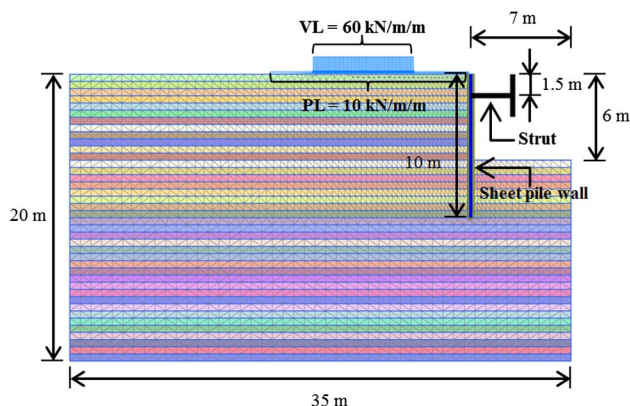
Layout of the two-dimensional finite element model of braced excavations.
